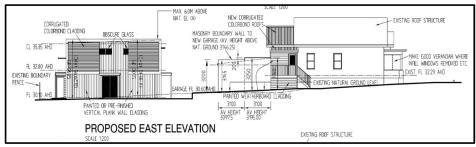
Proposed East Elevation showing proposed dwellings sitting below existing dwelling. Source: Application Documents.
